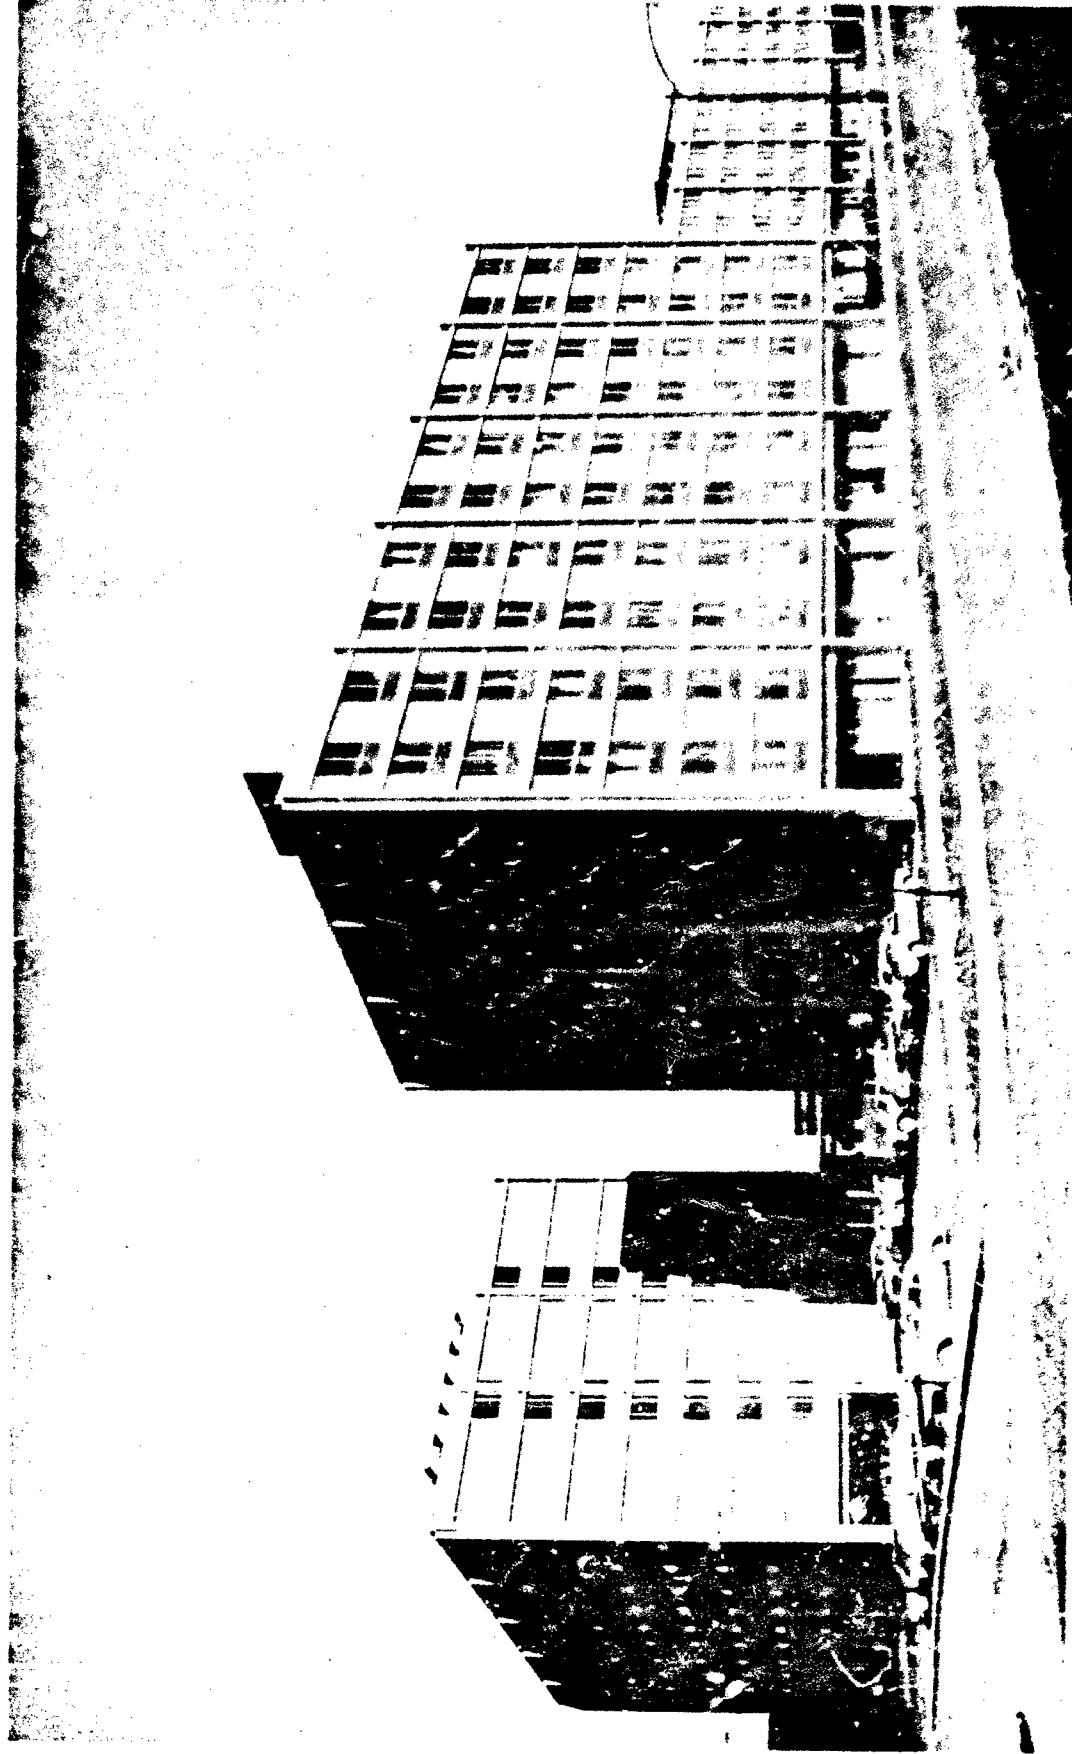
TEST BUILDINGS, WEST EXPOSURE
